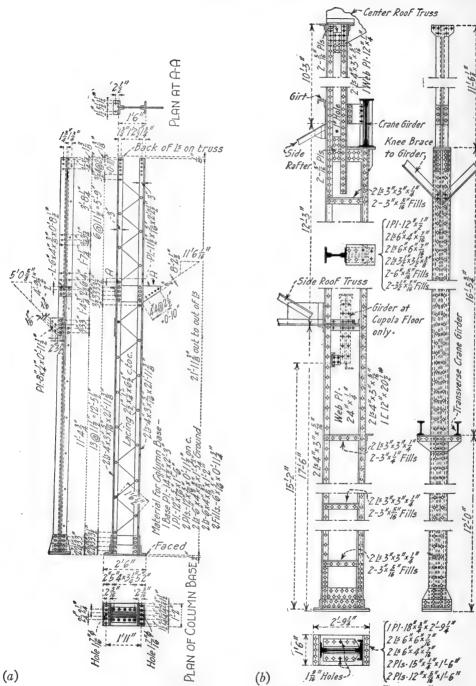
DETAILS OF MILL BUILDING COLUMNS.
